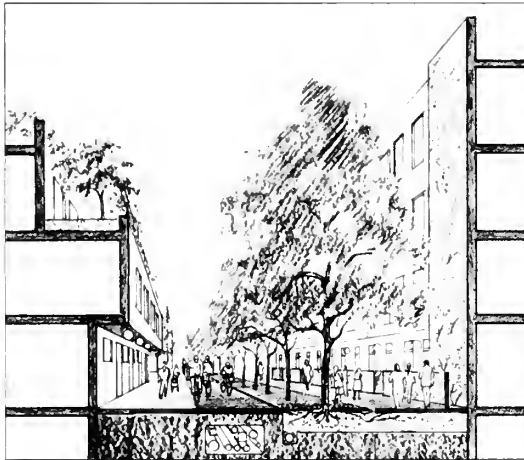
Figure C. Section perspective showing how tree roots can be accommodated on a narrow street retrofitted for pedestrians, bicyclists, and trees. Note large volume of special soil and subsurface drainage.
